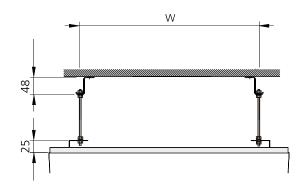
Assembly fittings SYST MS. FRB: W = 326 mm
